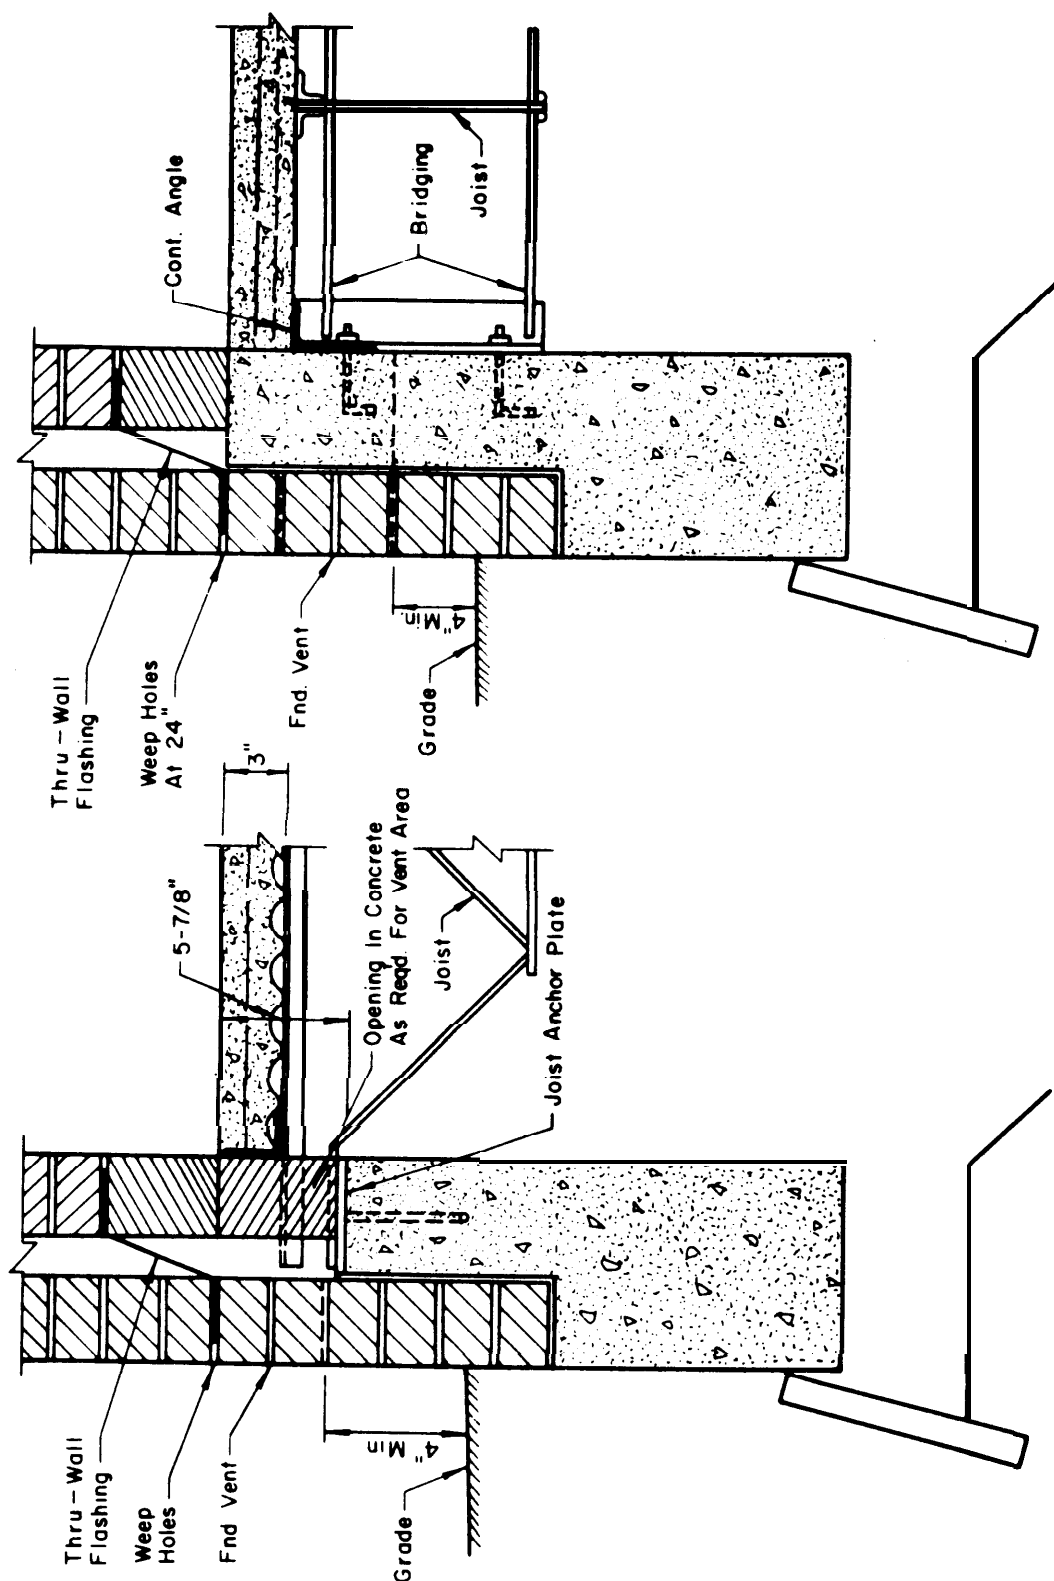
Typical cast-in-place or precast concrete grade beam with steel bar joist floor framing.
